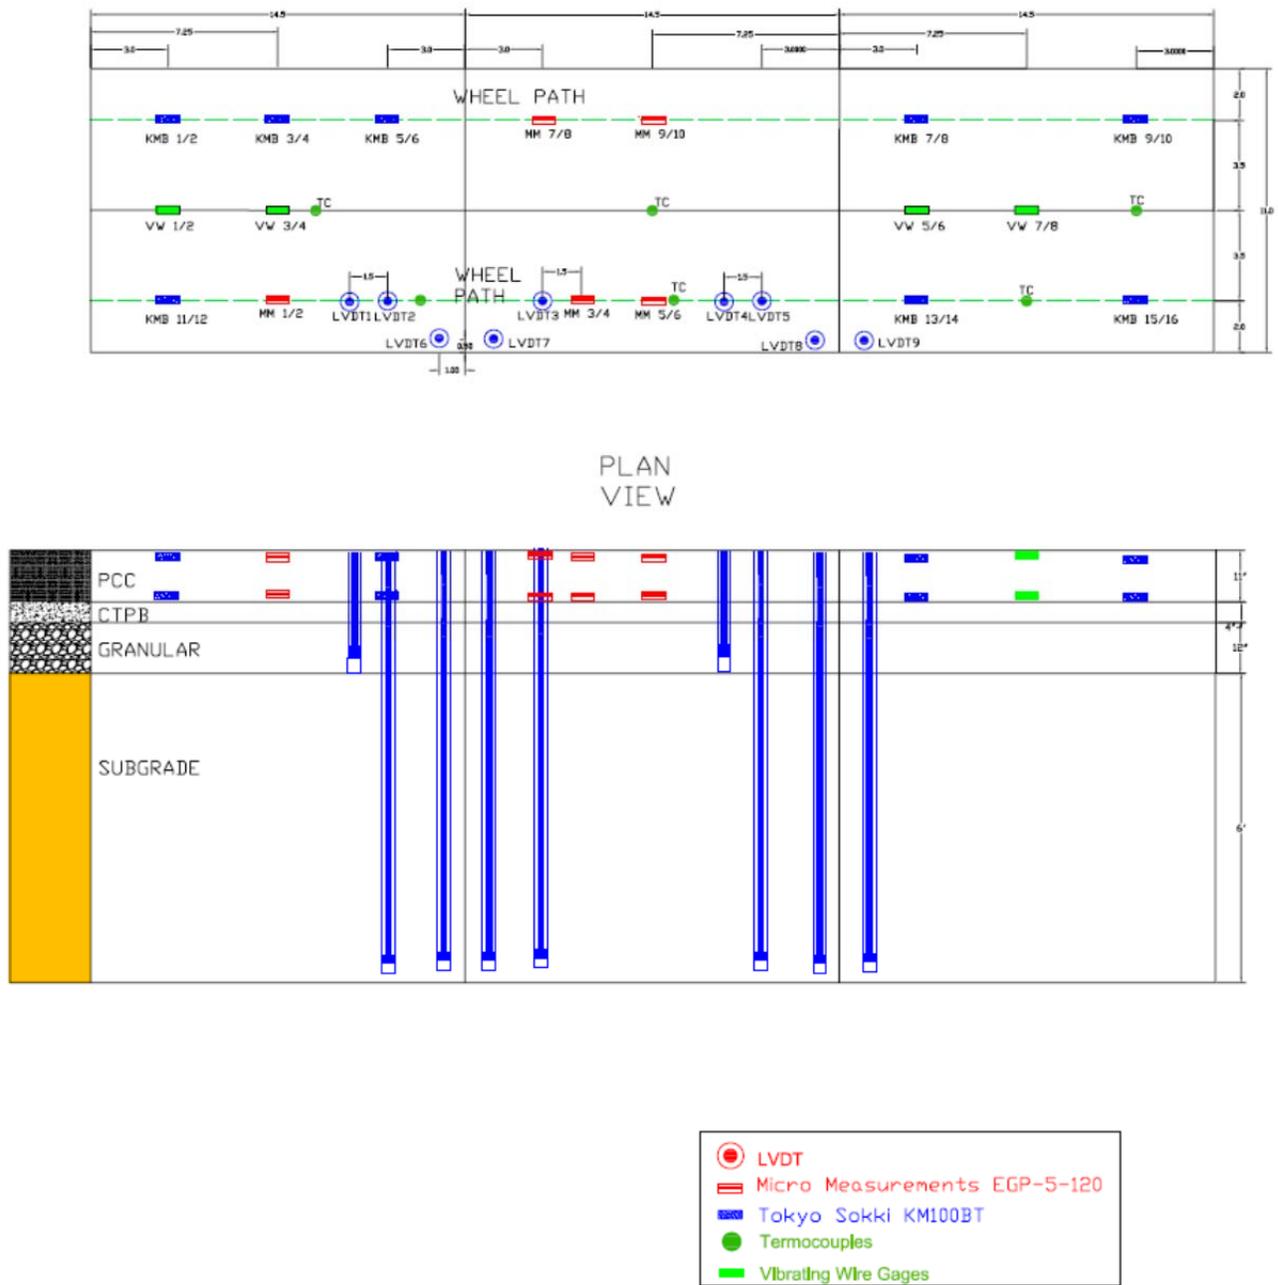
Plan and Profile Views of Instrumentation on RT9A.
